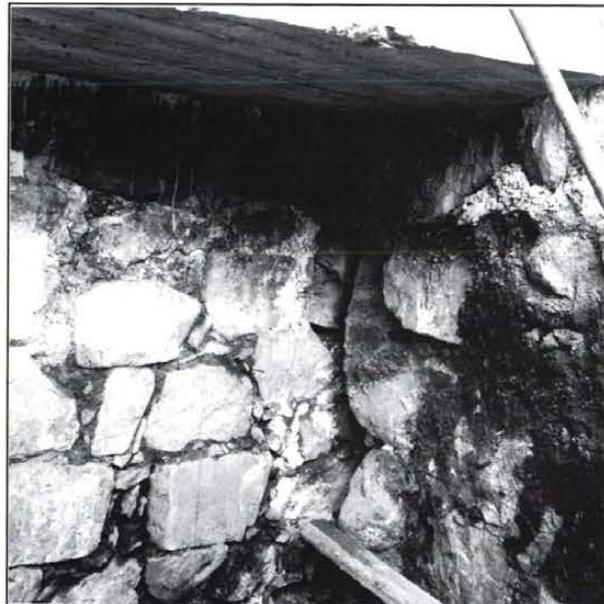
On the left in the picture is the older southwest wall of the east outer bailey, with the south wall of the smithy ward, built to join the former, on the right. In the upper section is the present southwest wall, built on top of both walls. (Archives of the Dept. Of Monuments and Sites, NBA, Turku Castle. Photo negative 2452)
